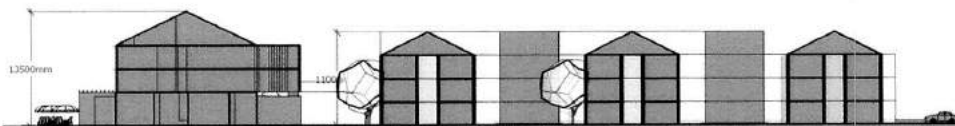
Sketches showing the planned Frail Care and Dementia and Alzheimer facilities proposed for the application site.
